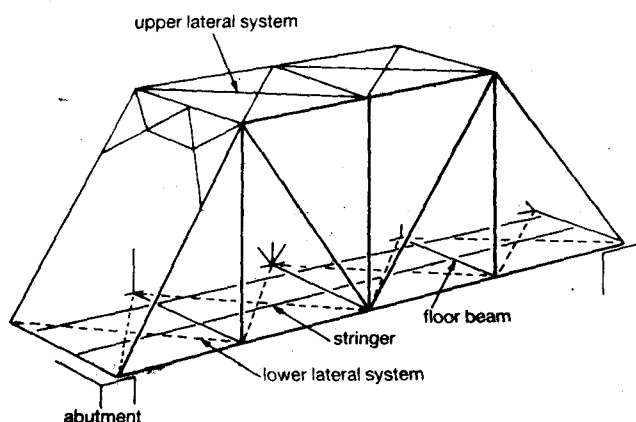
Schematic or 'model' of a truss bridge.
